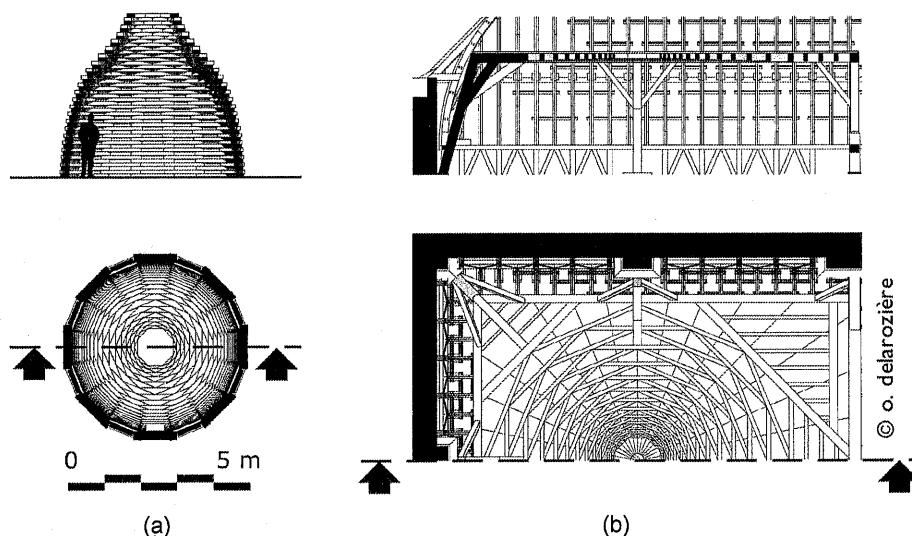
, Section and reflected ceiling plan of (a) A *Woodstacker* stacked lamella timber cupola. Champ-au-Beau, France, 2010 and (b) the roof frame of Saint-Germain-des-Prés. Musée des arts et métiers inv. 10979. Scale: 1:200. © O. D.
